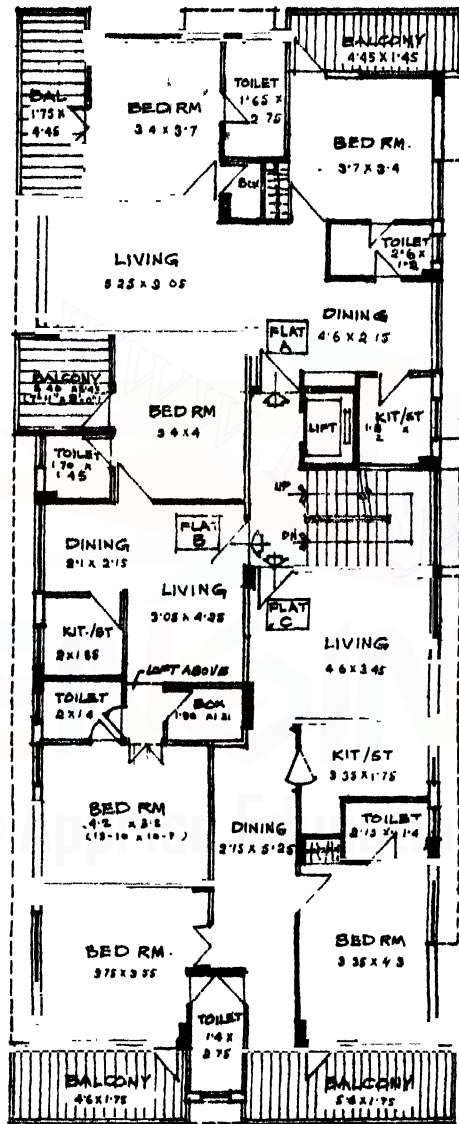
MULTI-STORIED BUILDING WITH THREE 2 BED ROOMED FLATS PER FLOOR.
